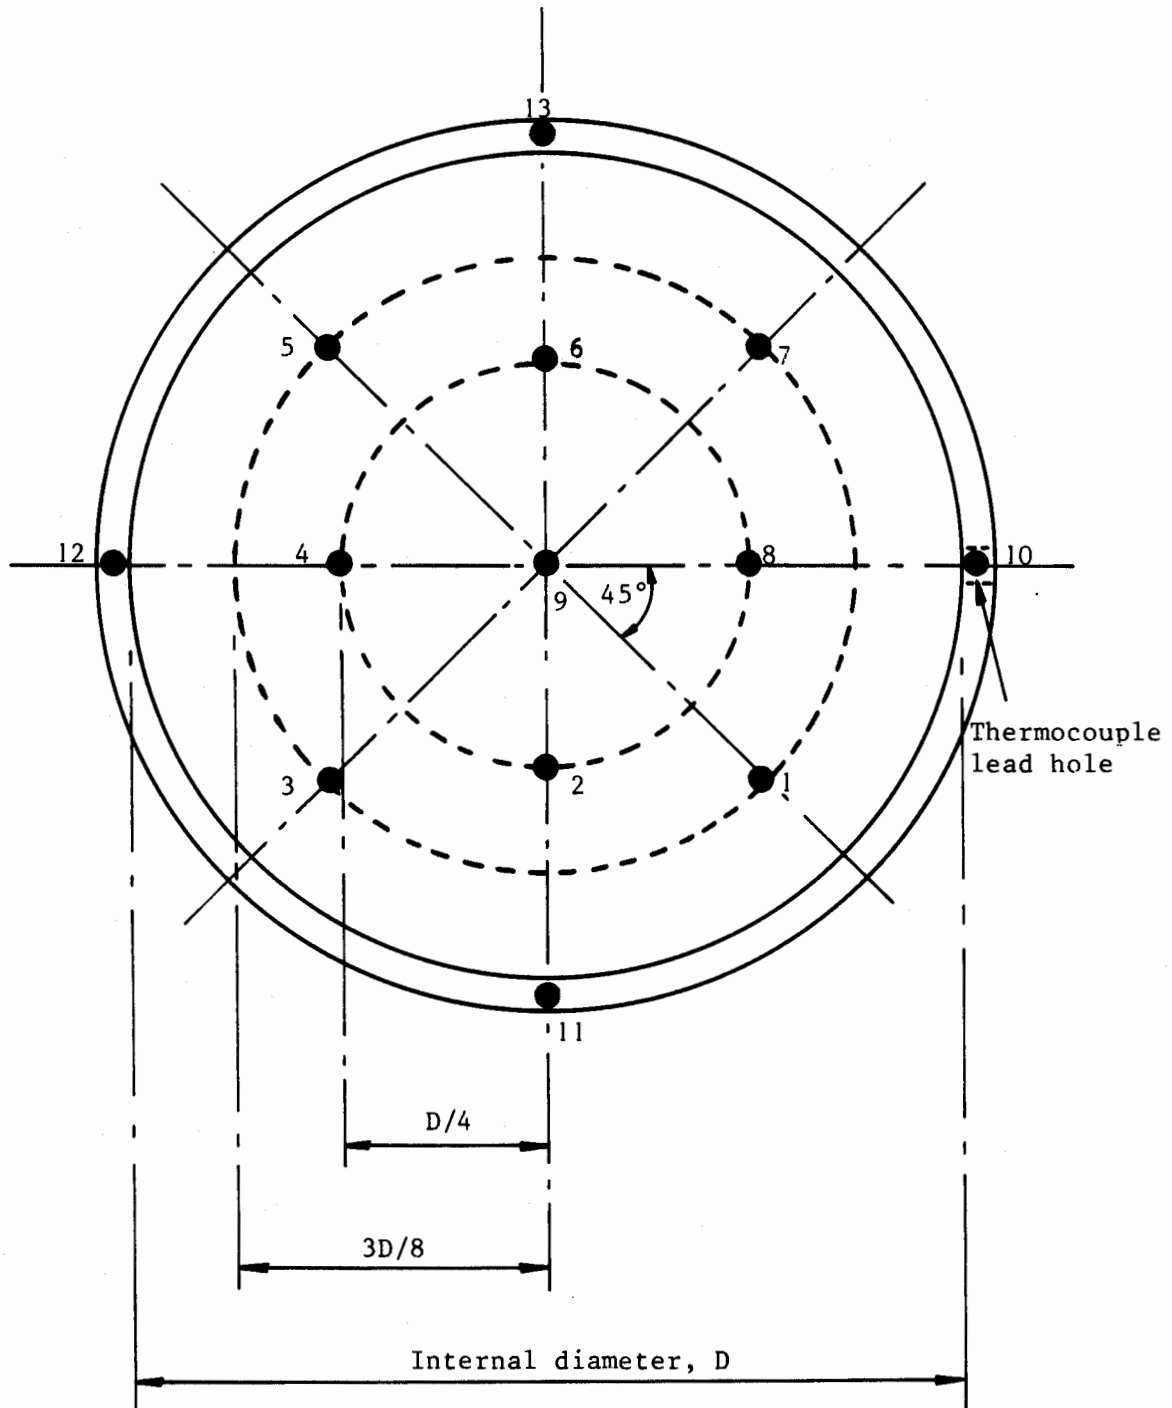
THERMOCOUPLE POSITIONS IN THE STEEL AND CONCRETE
